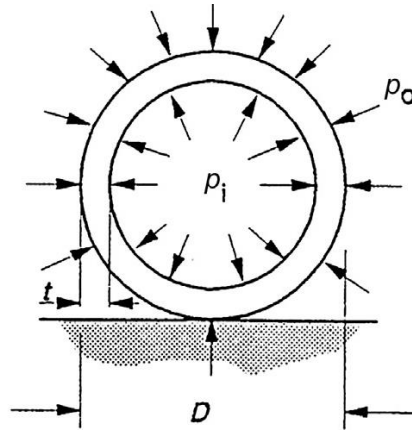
Internal and external pressure imposed on the walls of the pipe [Bai & Bai (2014)].
